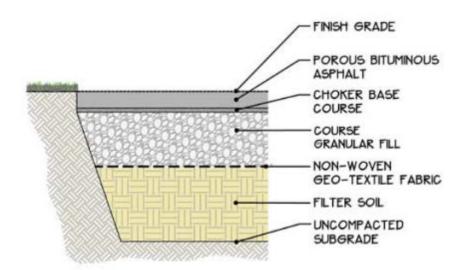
Example Porous Asphalt Cross-section (Source: EPA, 2009)
